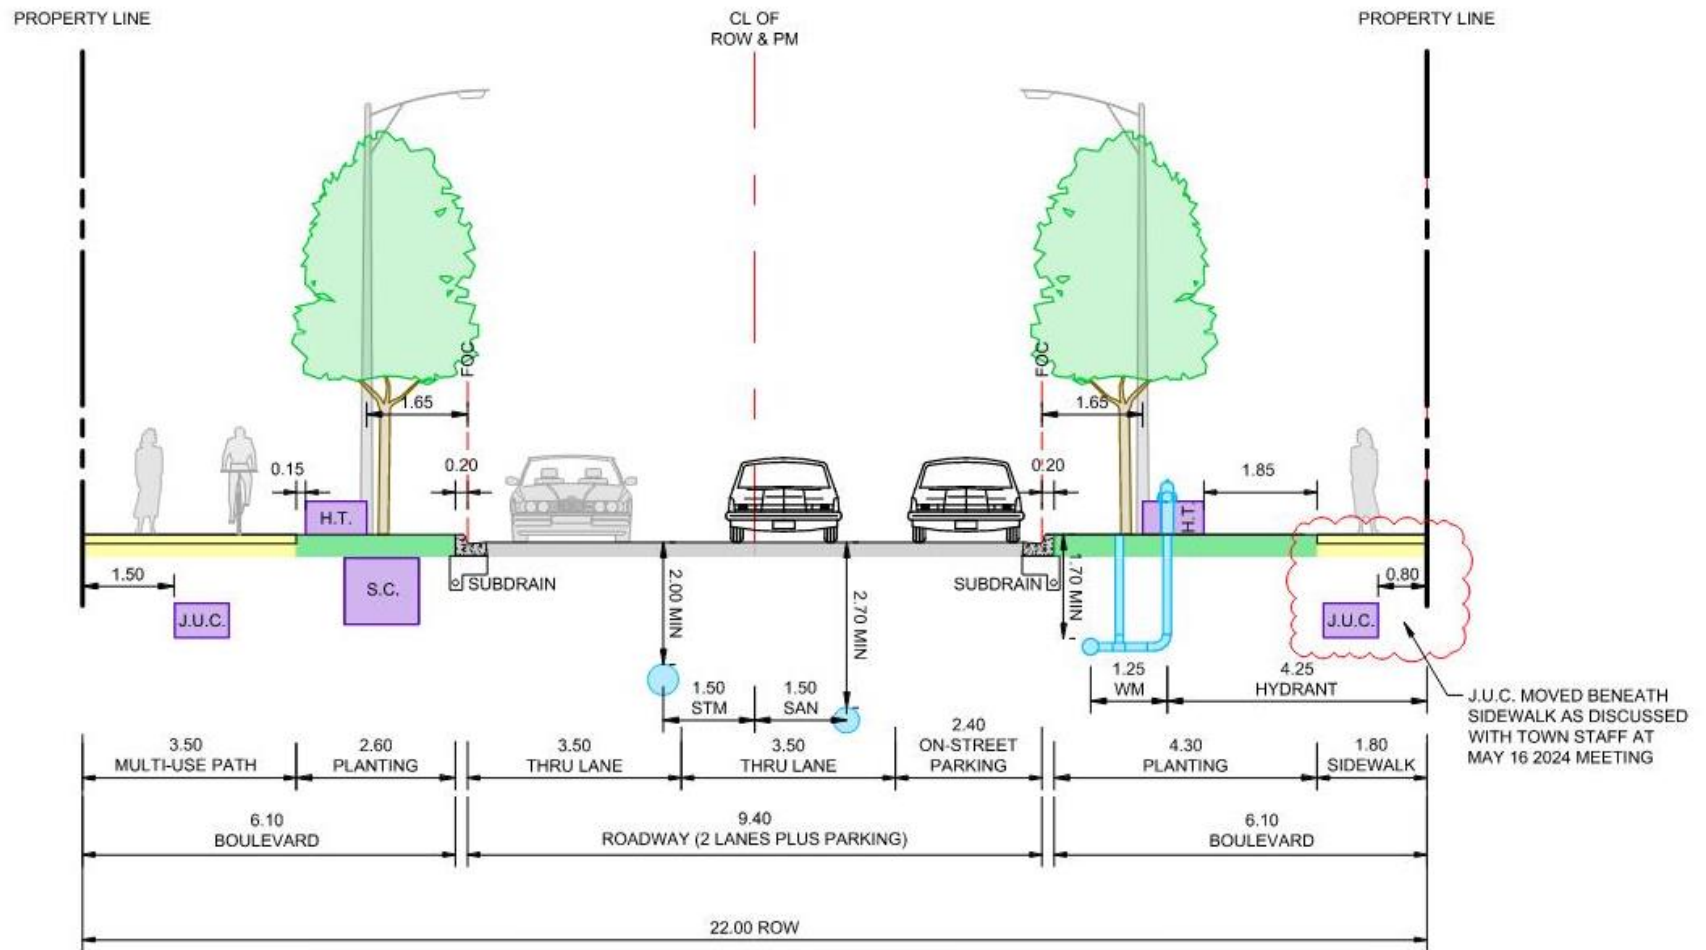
22 METRE CROSS-SECTION: COLLECTOR ROADS
